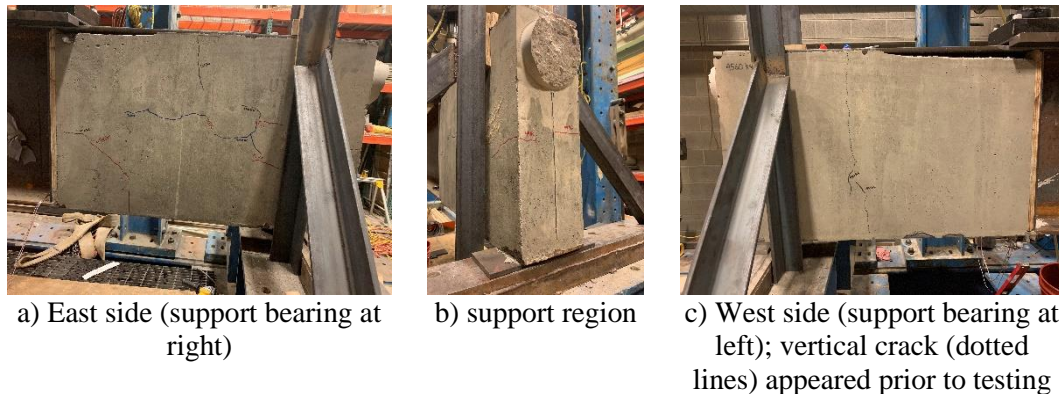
Cracking observed during fatigue conditioning of Girder 5B.
